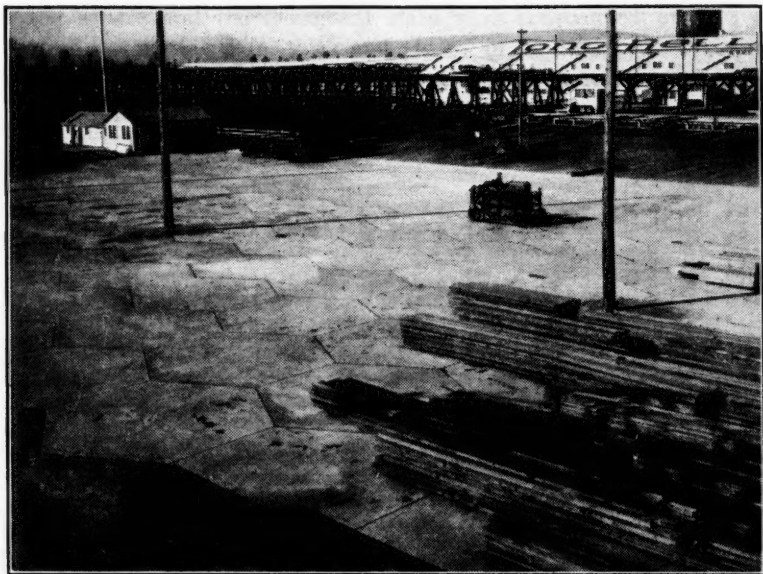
VIEW OF PAVEMENT OF HEXAGONAL SLAB DESIGN CONNECTING LONG-BELL WEST FIR MILL WITH DOCK "A", UNDER CONTINUAL HEAVY TRAFFIC AND STORAGE.
